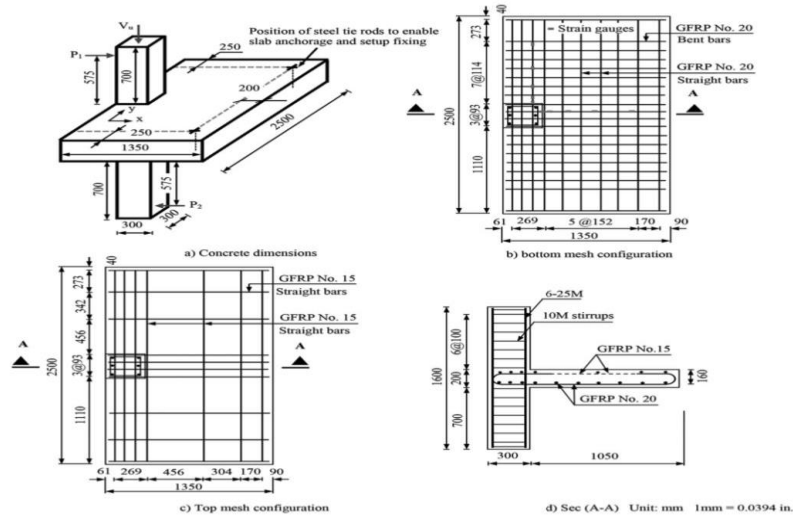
The Typical Geometry of Slabs and Their Reinforcement [19].
